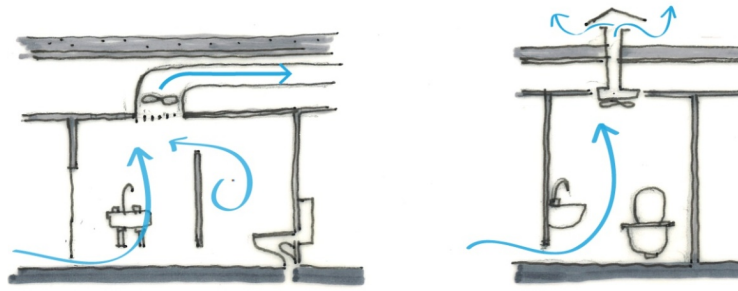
Sketch of Toilet Ventilation on Ground Floor, left, and First Floor, right, in the new building
